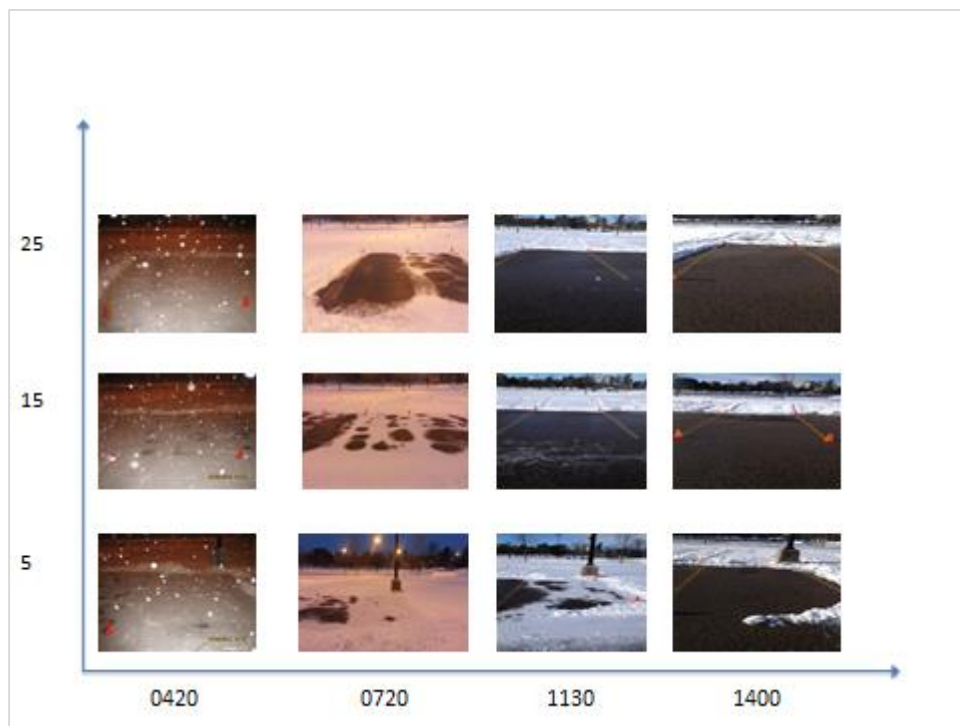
Sample Pavement Surface Condition Images in Deicing Sections (3 Jan, 2013)
